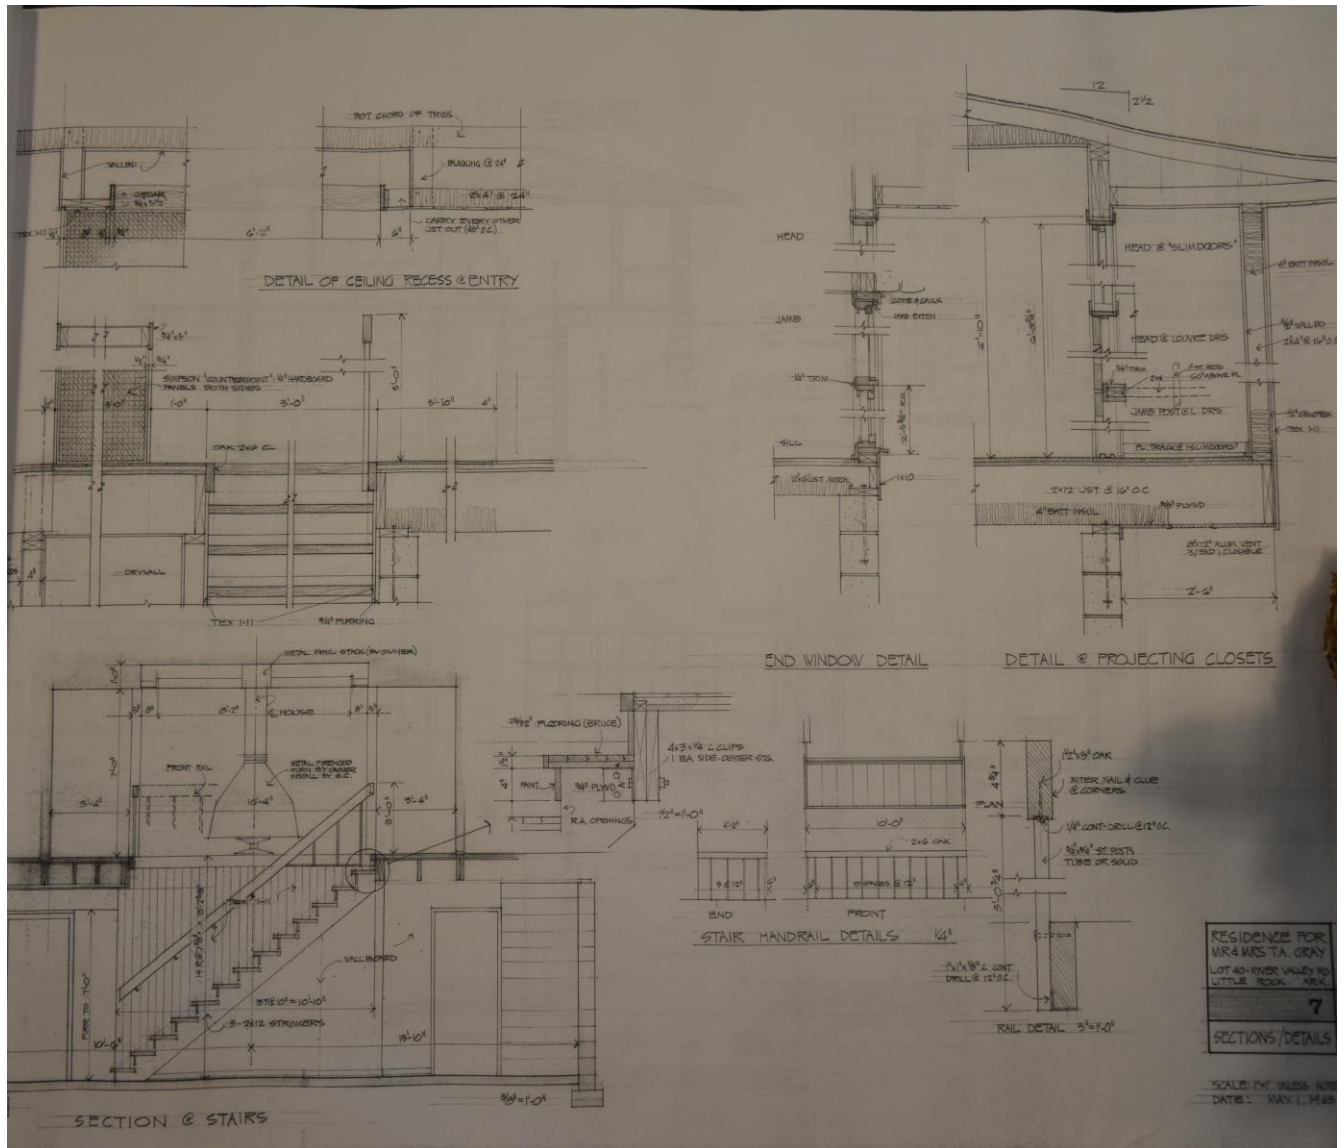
Section and Detail drawings of the Thomas Gray House, 1963.
